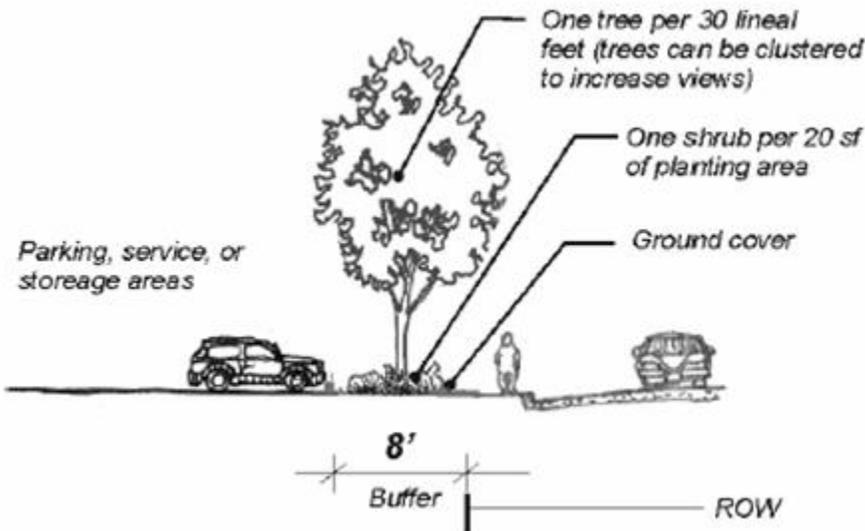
Illustrating standards for landscaping buffers between a street and parking lot. ~~Reserved.~~
